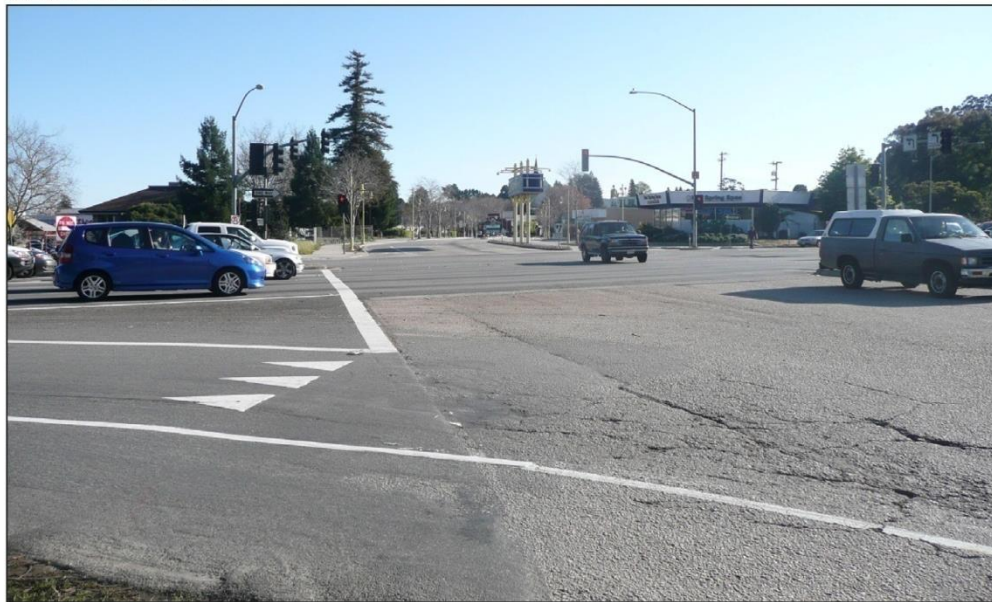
Looking south from the northeast corner of the Route 1/9 intersection toward River Street.
